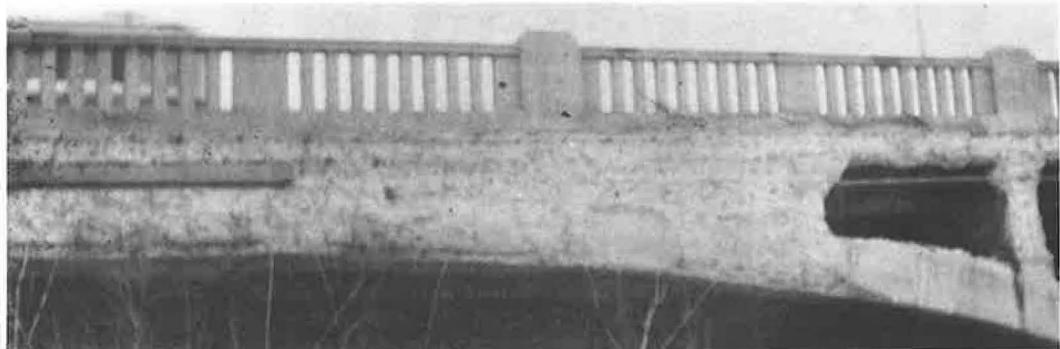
Spalled arch ribs before repair, 112th St. Bridge, Troy.
